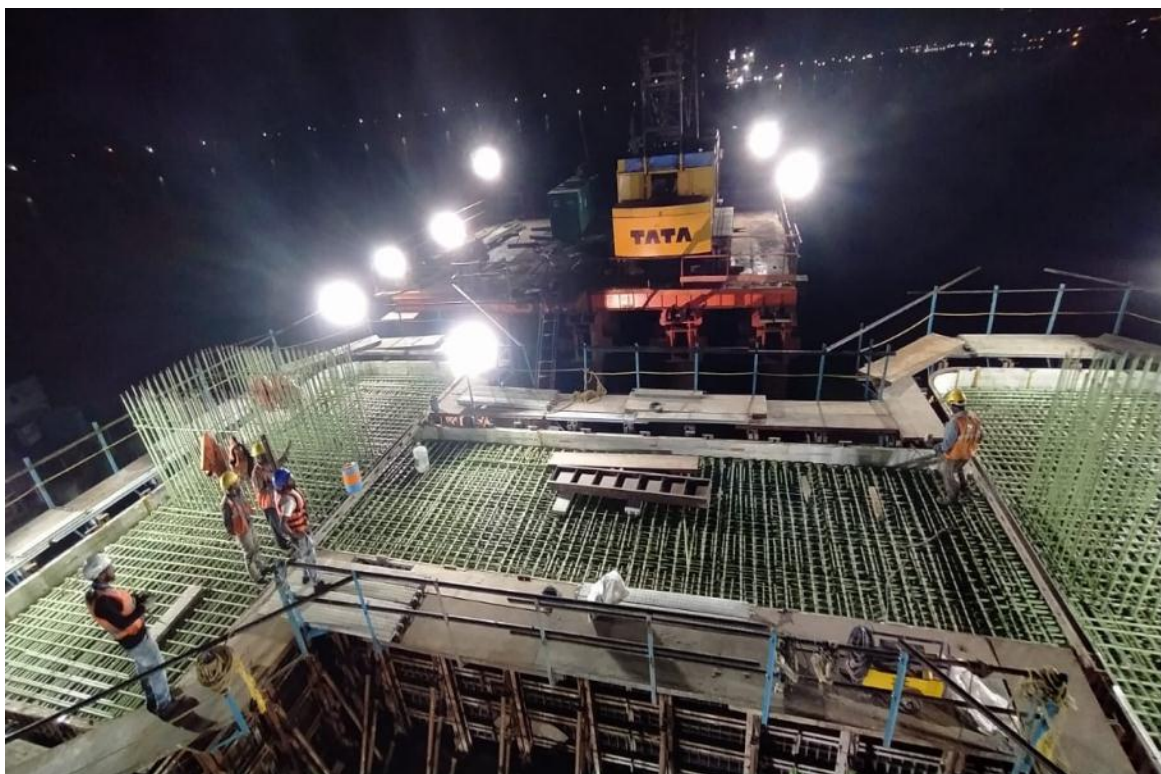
MP 93 Pile Cap Pre-pour Inspection- Marine Area
